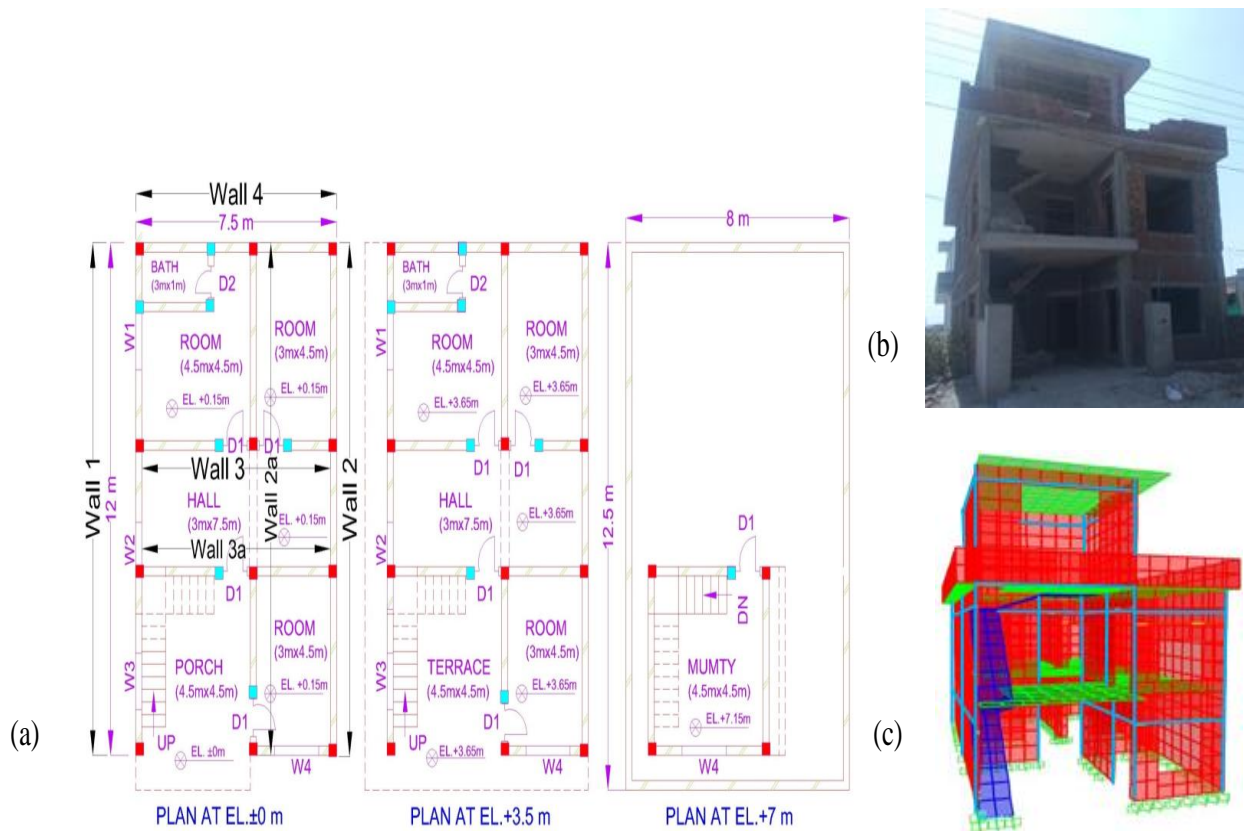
Under construction building (a) architectural plans of all levels (b) original structure under construction (c) three dimensional geometrical SAP model
